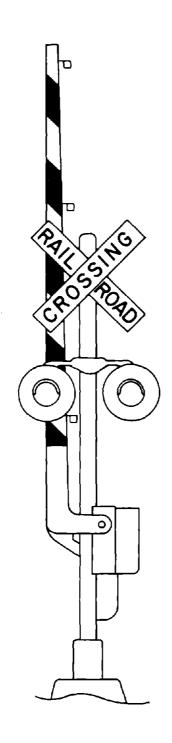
GATE AND FLASHING LIGHT INSTALLATION
